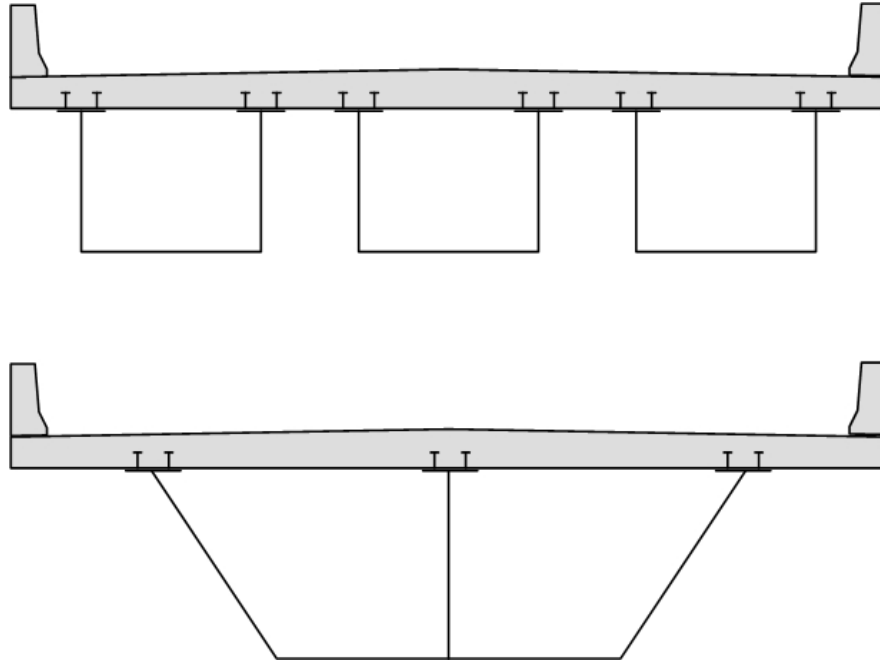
Box Girder Cross Sections with Composite Deck
